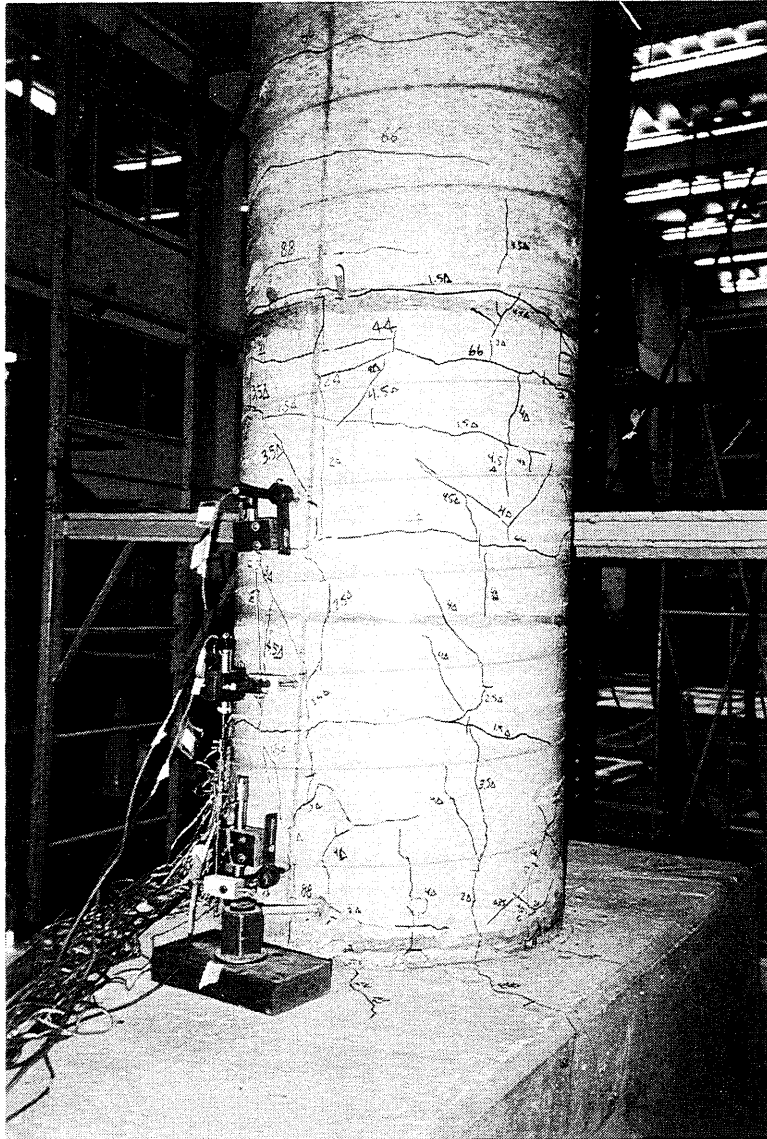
Cracks on Tension Face for Negative Loading
